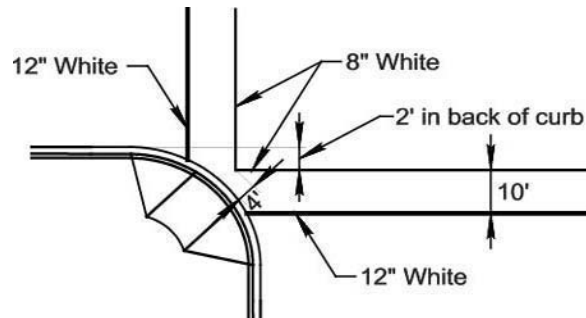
SINGLE RAMP CROSSWALK MARKINGS
